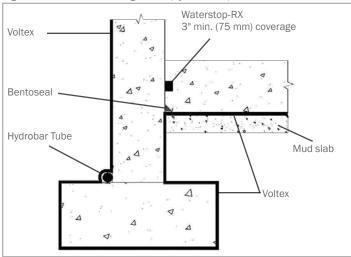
Raised slab detail with mud slab (hydrostatic)
